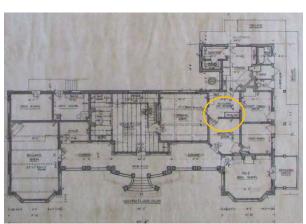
Scullery and Breakfast Room dividing wall shown (circled) on the original ground-floor plan.
